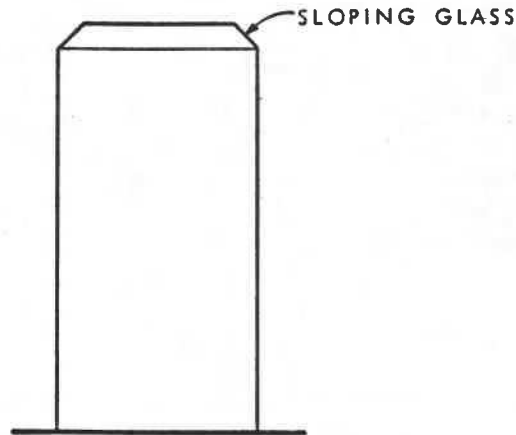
High-rise building showing 45° sloping glass around top of building.
